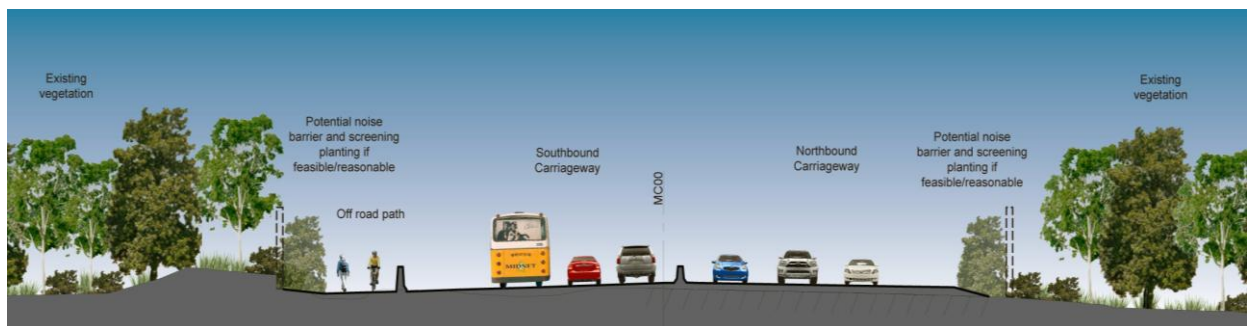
Indicative road cross section 1400 metres south of Alfords Point Bridge
